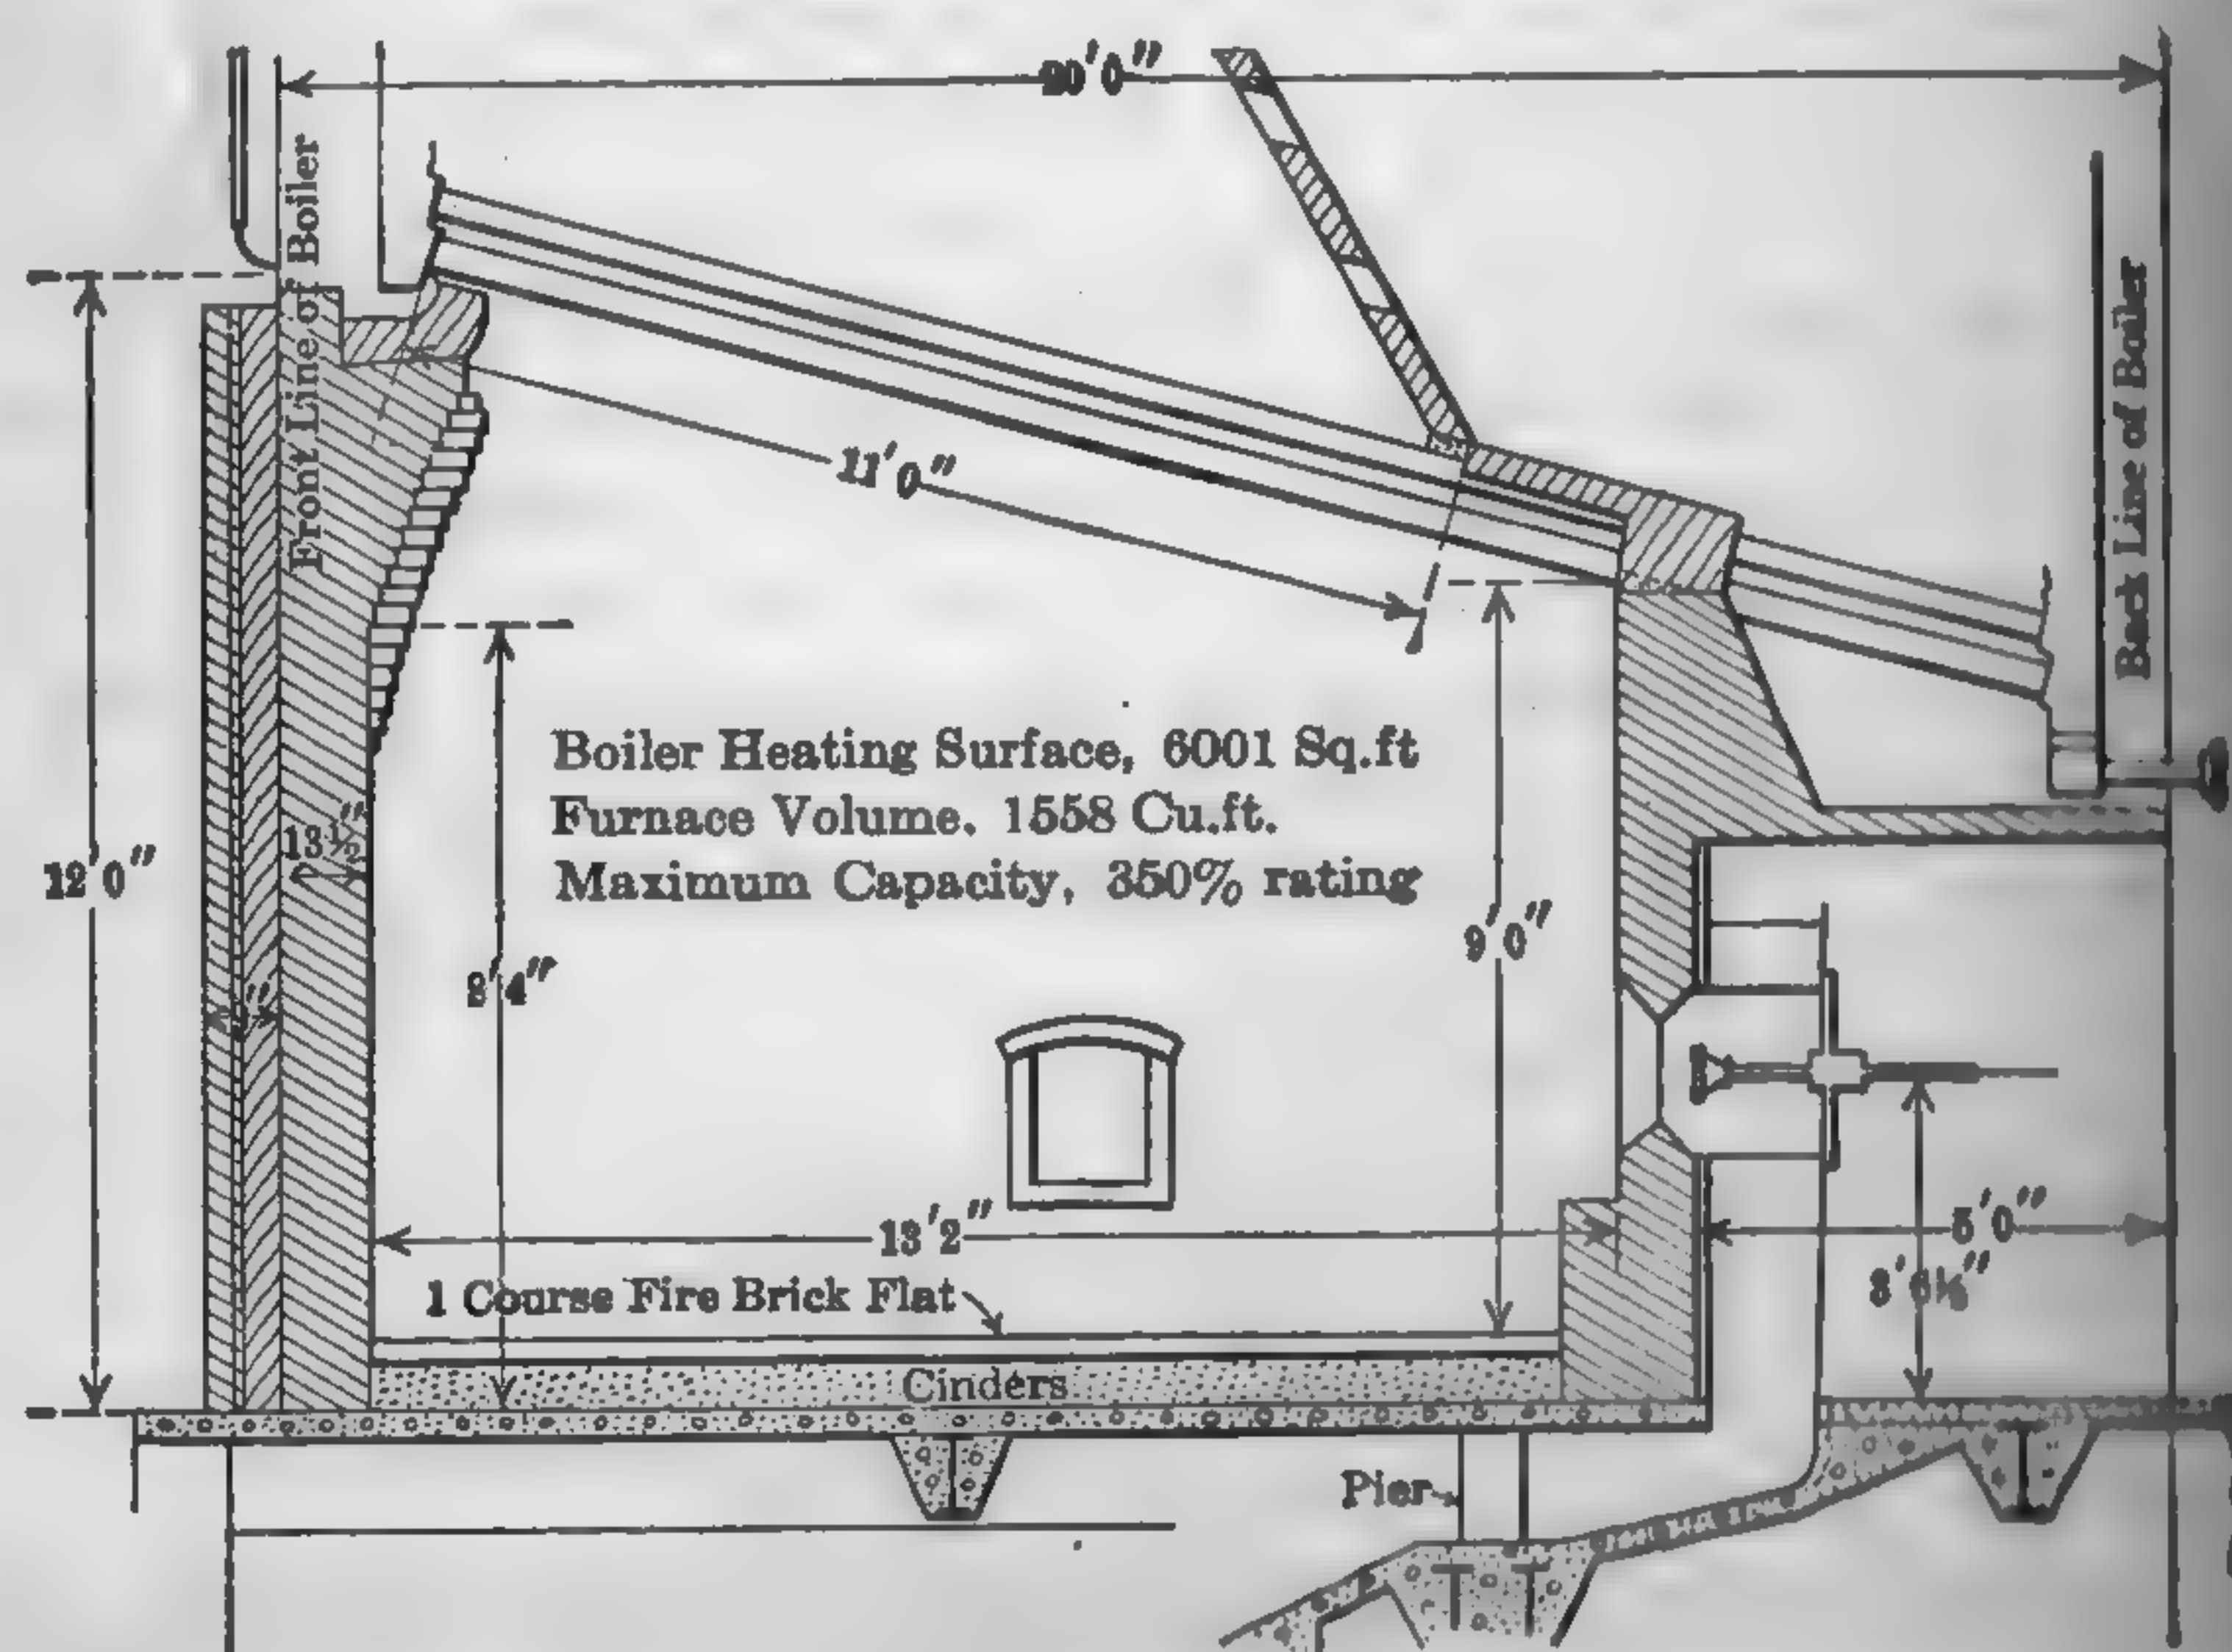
Oil-fired Furnace. Narragansett Elec. Lt. Co., Mechanical Burner
